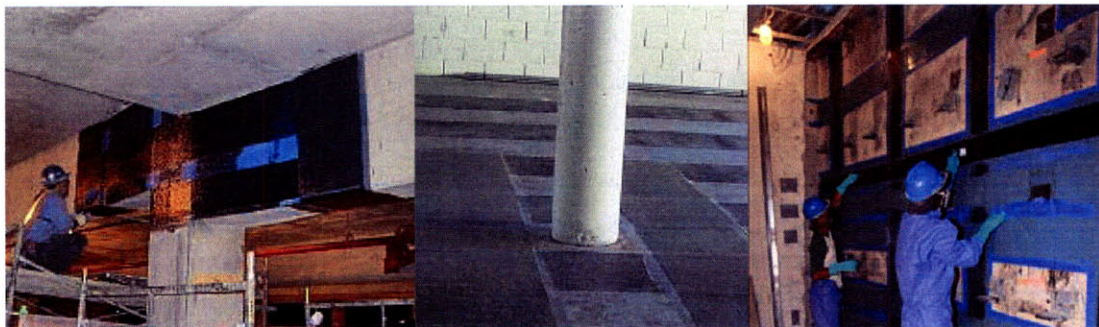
Retrofit of beam-column joint, slab and wall in RC buildings using CFRP (Sika, 2009)
